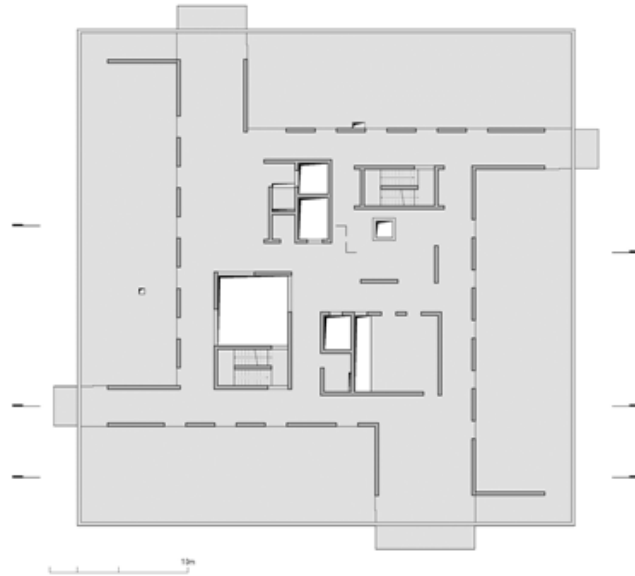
The “Elena Cerio” retirement home in Giornico – ground floor plan (drawing by Pedrazzini Guidotti sagl, Lugano)
